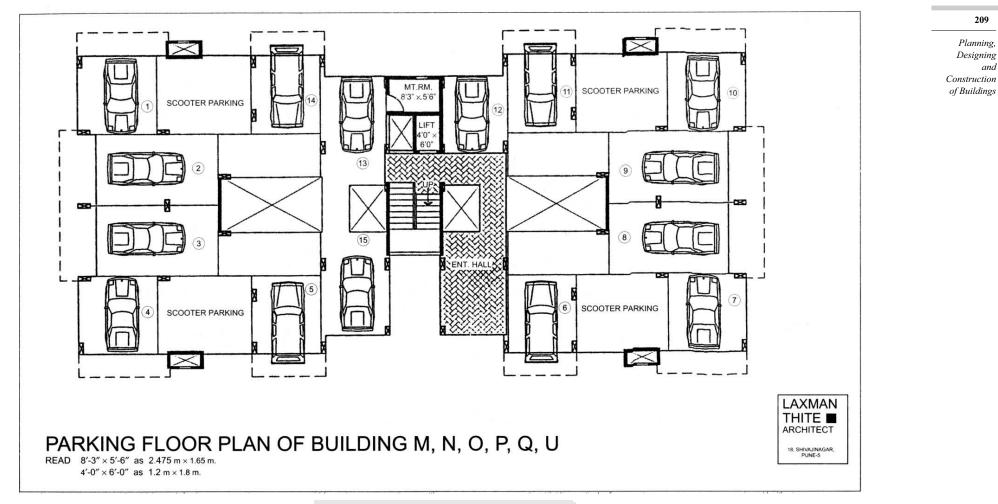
Sacred Heart Town – Parking Floor Plan
